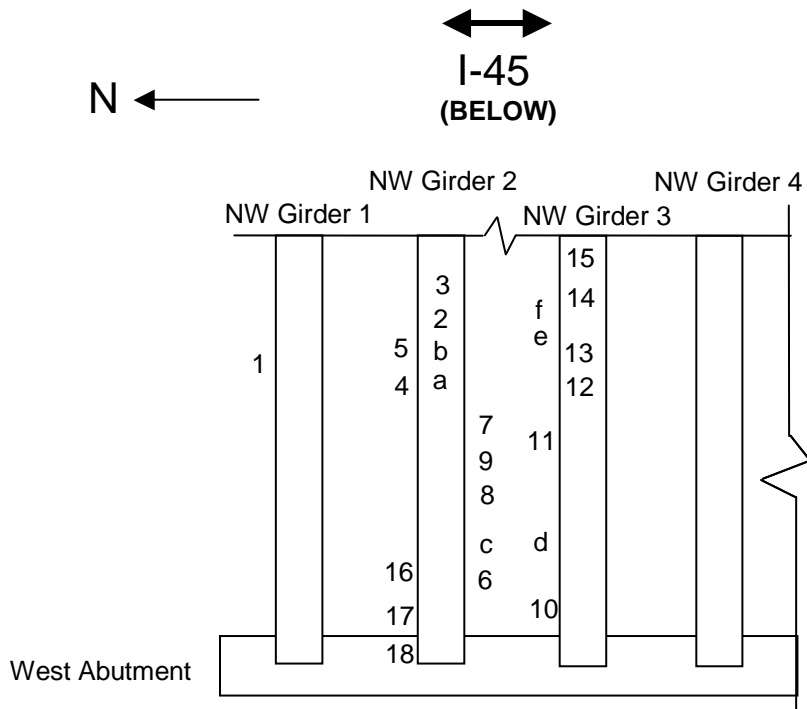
Schematic of crack-measurement locations on Robinson Road structure (plan view)
